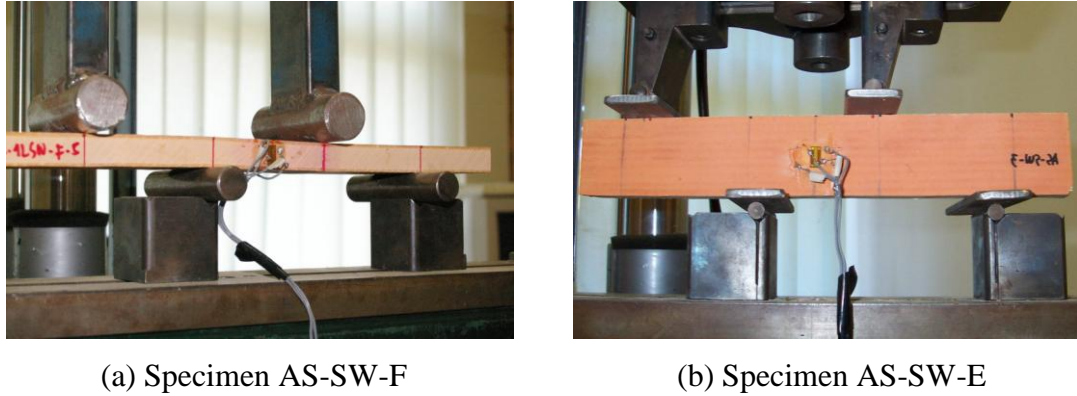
Test set-up for sandwich structures under asymmetrical beam shear test
